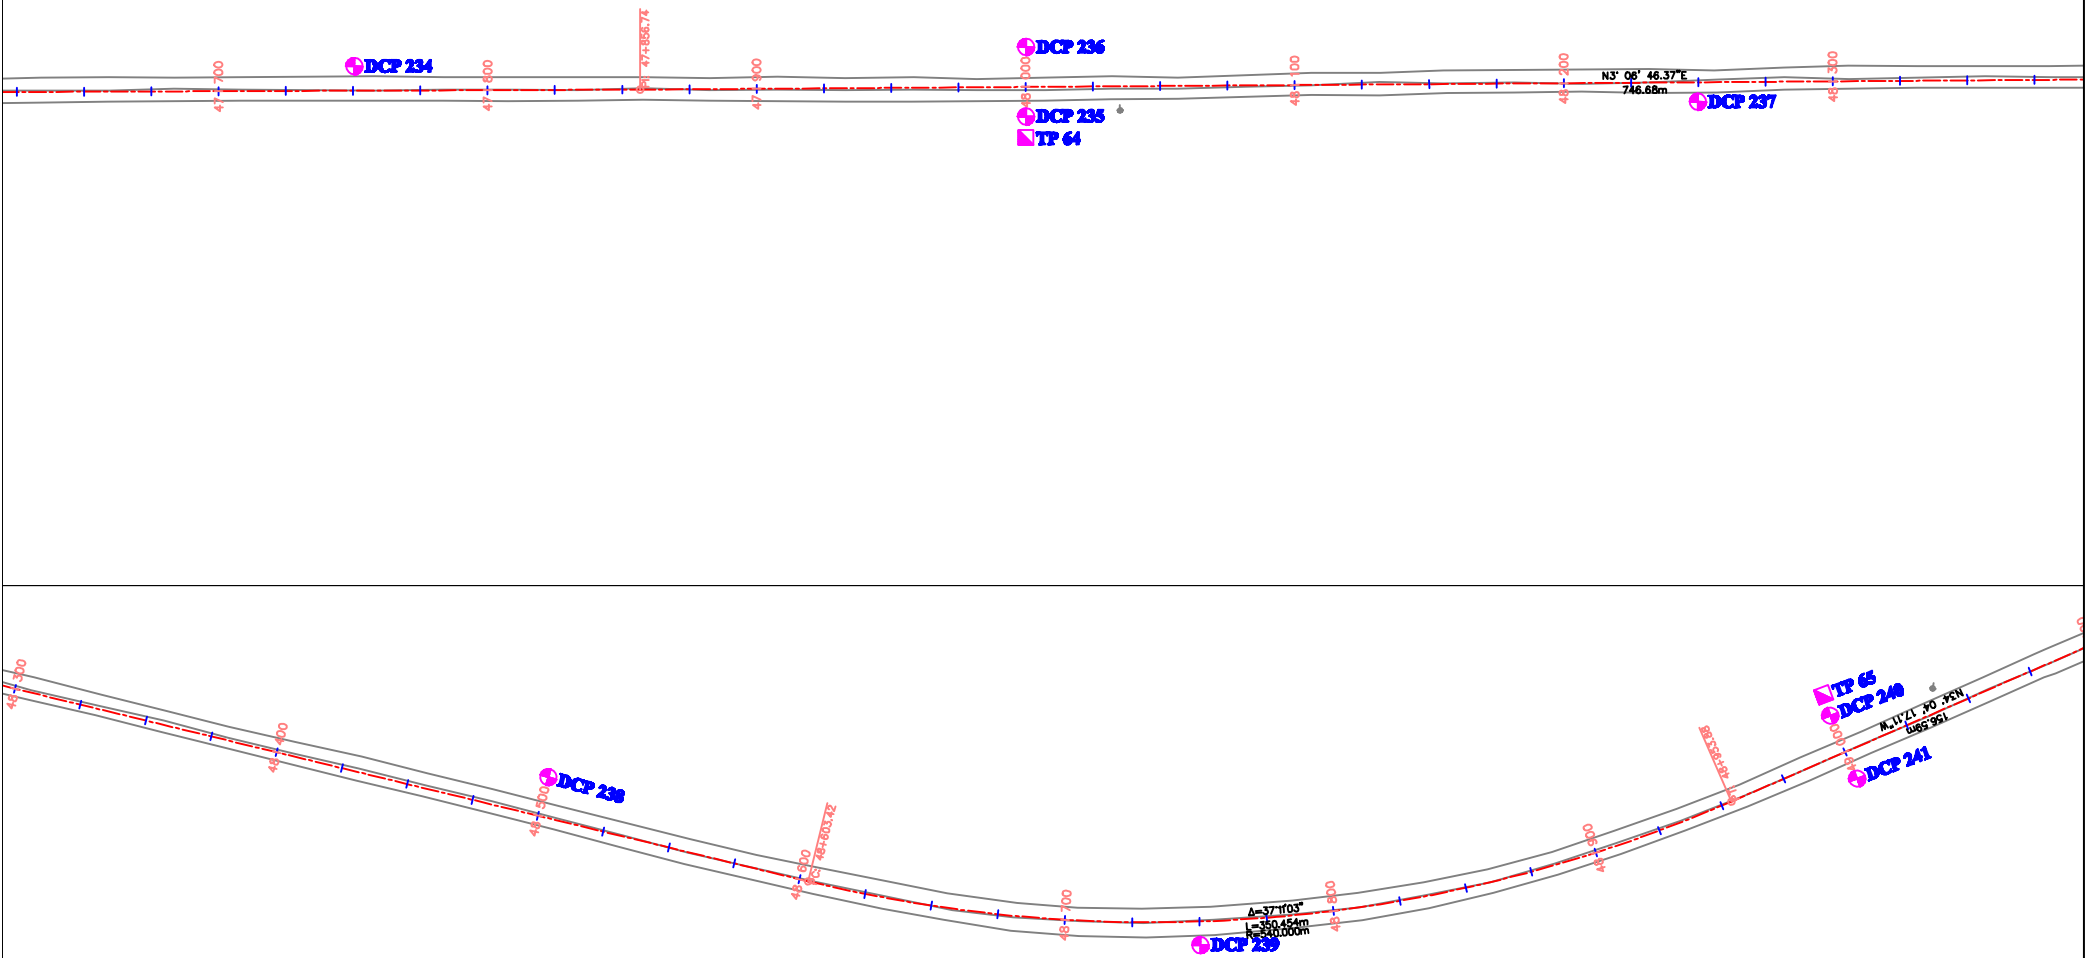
Location Plan of Test Pit Log and DCP Test
